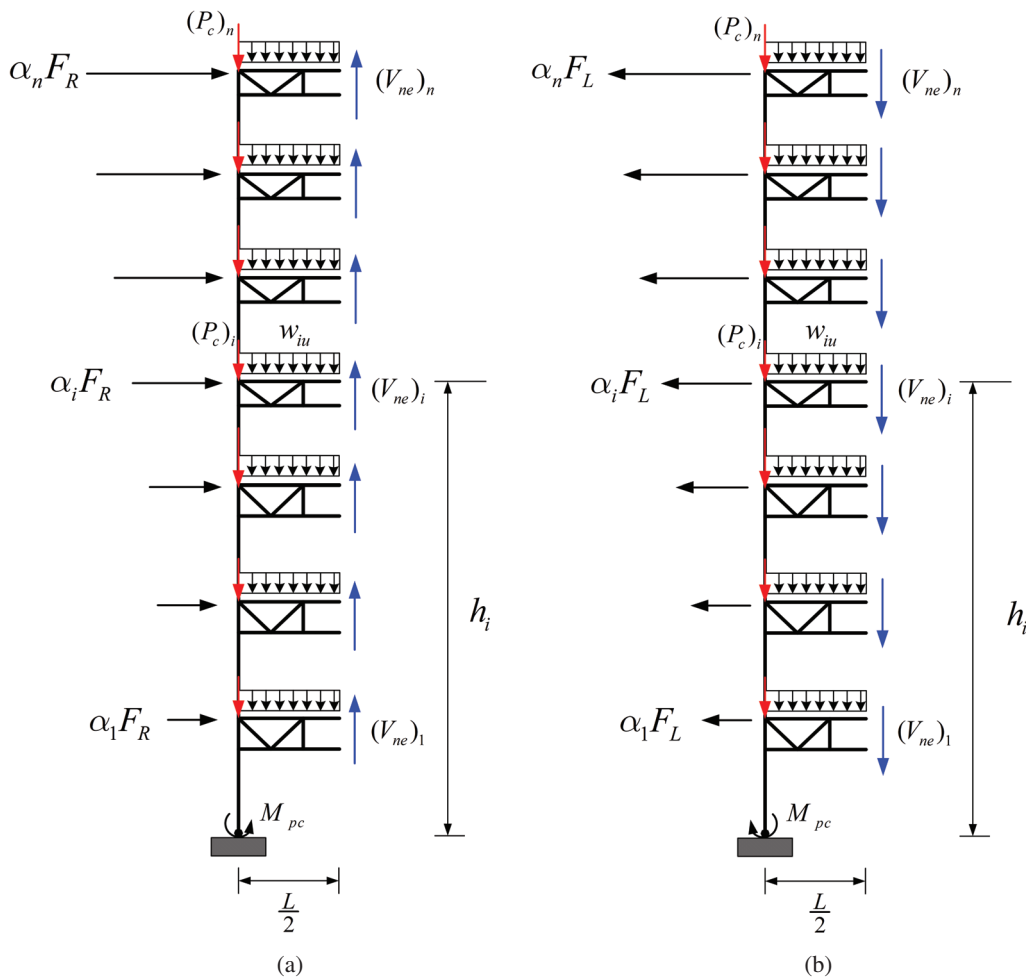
Free-body diagram of an exterior column and associated truss girder branches: (a) lateral forces acting to right side; (b) lateral forces acting to left side.
